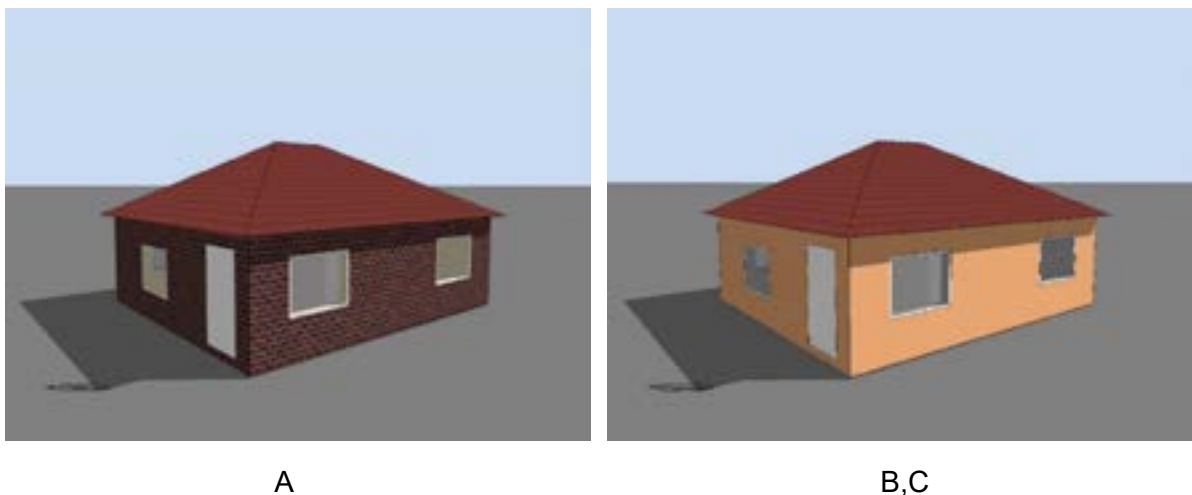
Models of designed houses. A – Heavyweight brick wall house model, B,C – Heavyweight/lightweight wooden wall house model
